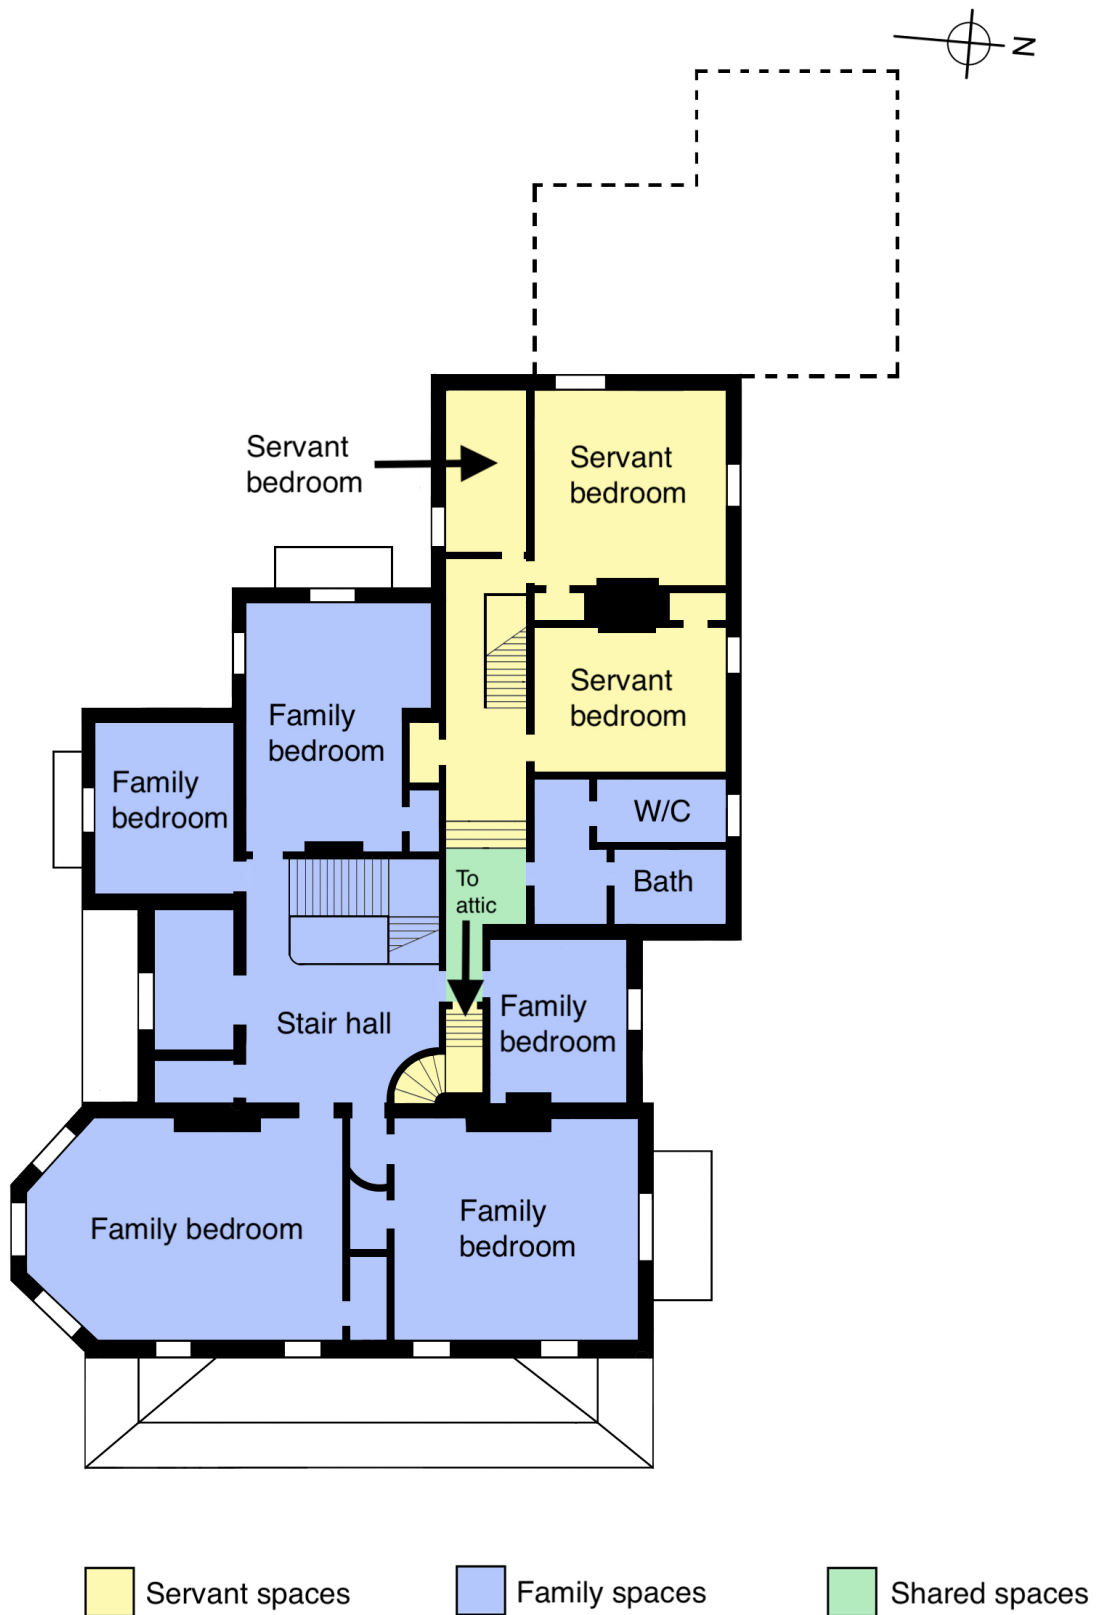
Kingscote 1878 Phase 2 first floor plan
